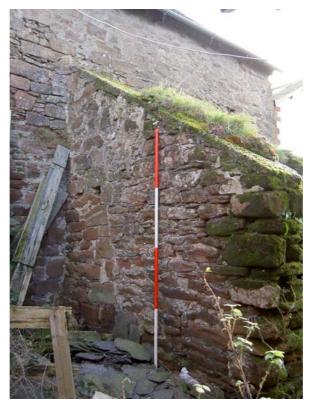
The north elevation of the south-west outshut attached to the west external elevation of the barn, showing the buttress
